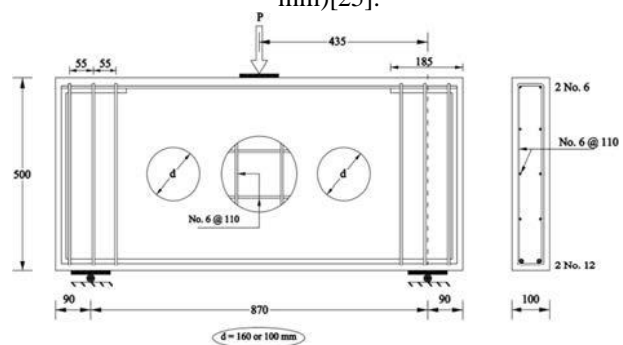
Group C and D Beam Detailing (units in mm)[25].
